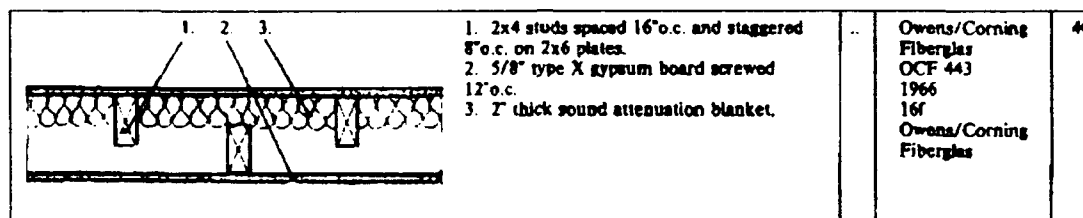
A wall section similar in construction to the Monterey Pines Apartments, with an STC rating of 46.
